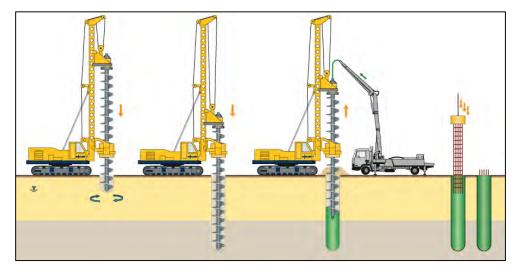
CFA Pile Installation Process (source: www.kellerholding.com)
